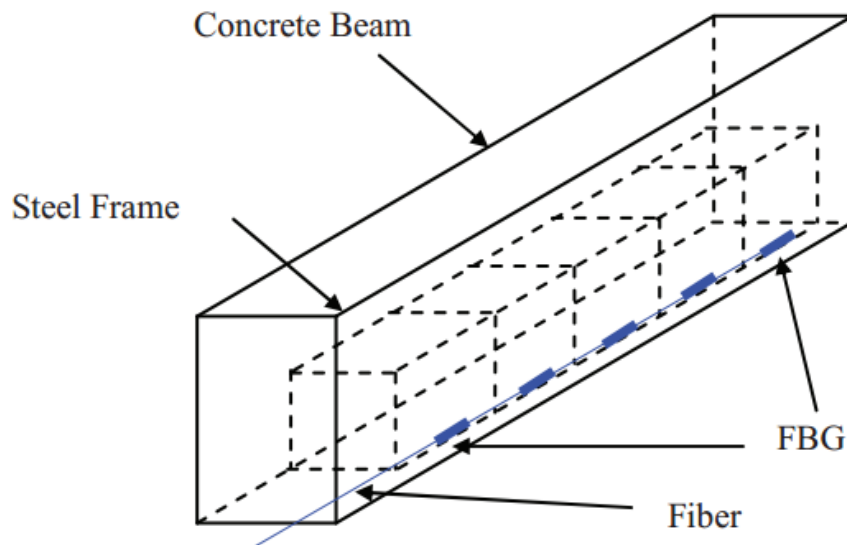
Reinforced concrete beams with FBG sensors (Junjie et al., 2011).
